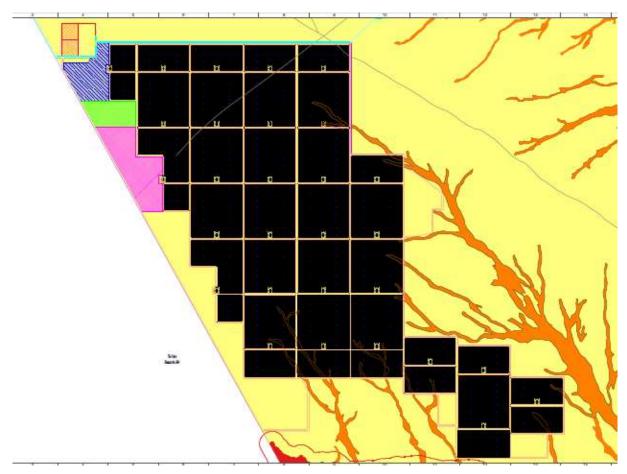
Duneveld PV Layout Alternative 1 (Preferred). Please refer to the full scale site layout plans attached in Appendix D.¹²
